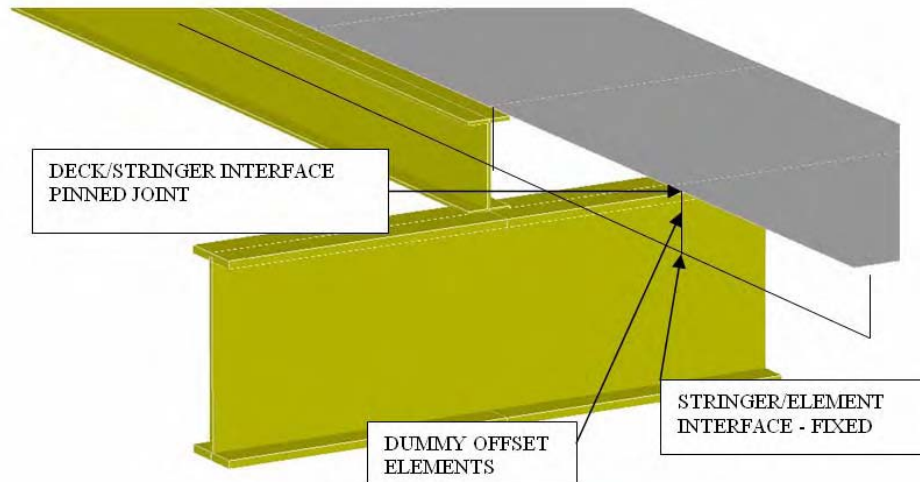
Rifle Bridge: Rendering of the 2” asphalt paving over 2.25” steel deck planks on steel floor beam. For clarity, near stringers have been intentionally not shown. Offset elements, from the beam centerline to the beam/stringer intersection to the stringer centerline to the deck/stringer interface were used. The rendering was produced by RAM Advanse.
